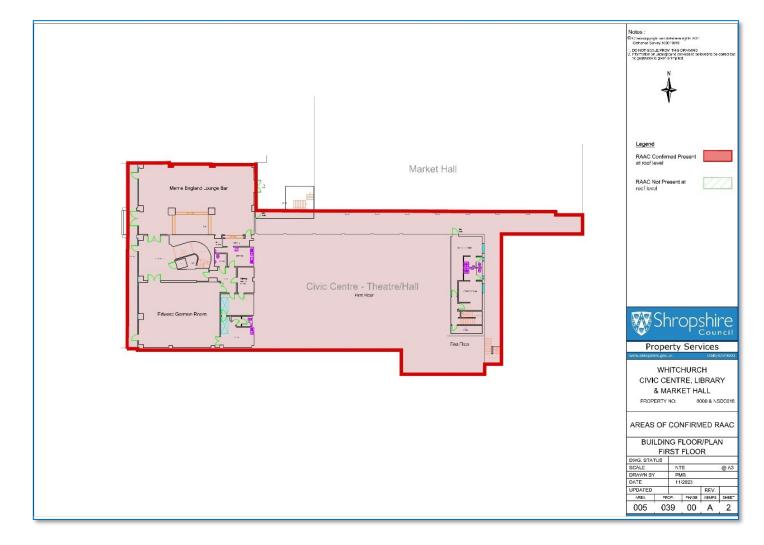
Whitchurch Library & Civic Centre - First Floor areas of confirmed RAAC at roof level
